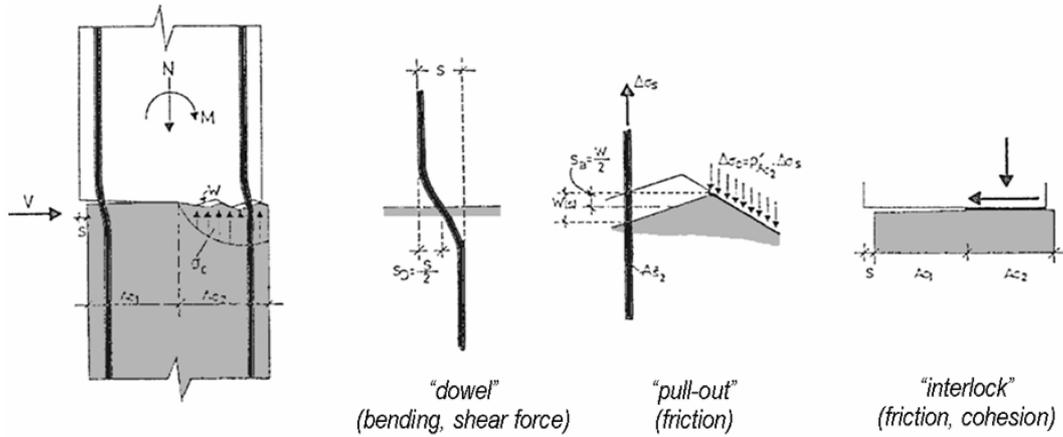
Transfer of shear across a concrete crack (Tsoukantas and Tassios 1989)
